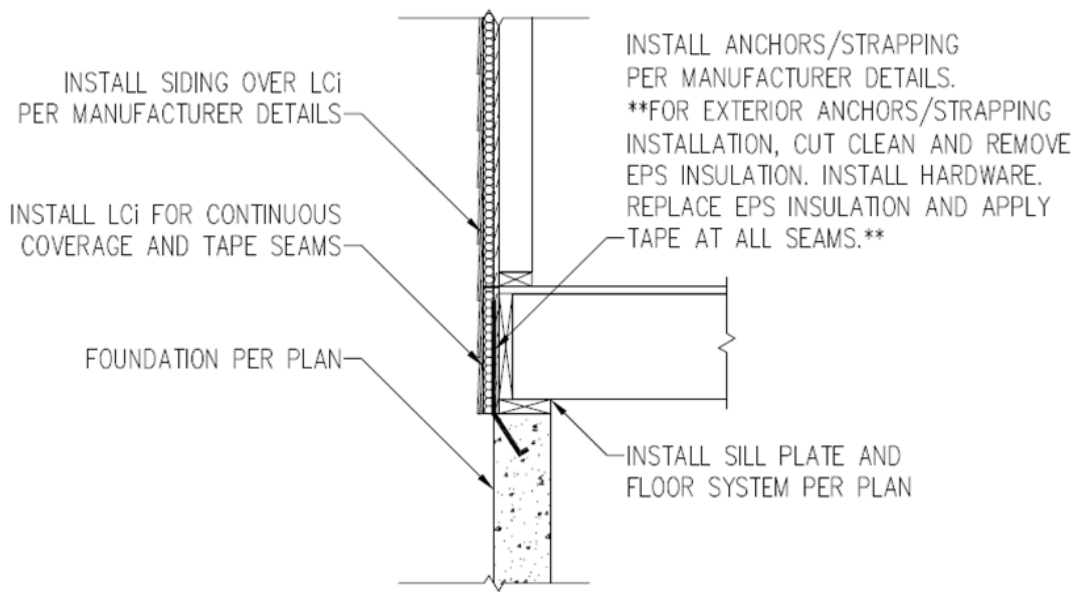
TYPICAL WALL SECTION AT FLOOR DECK WITH SIDING
